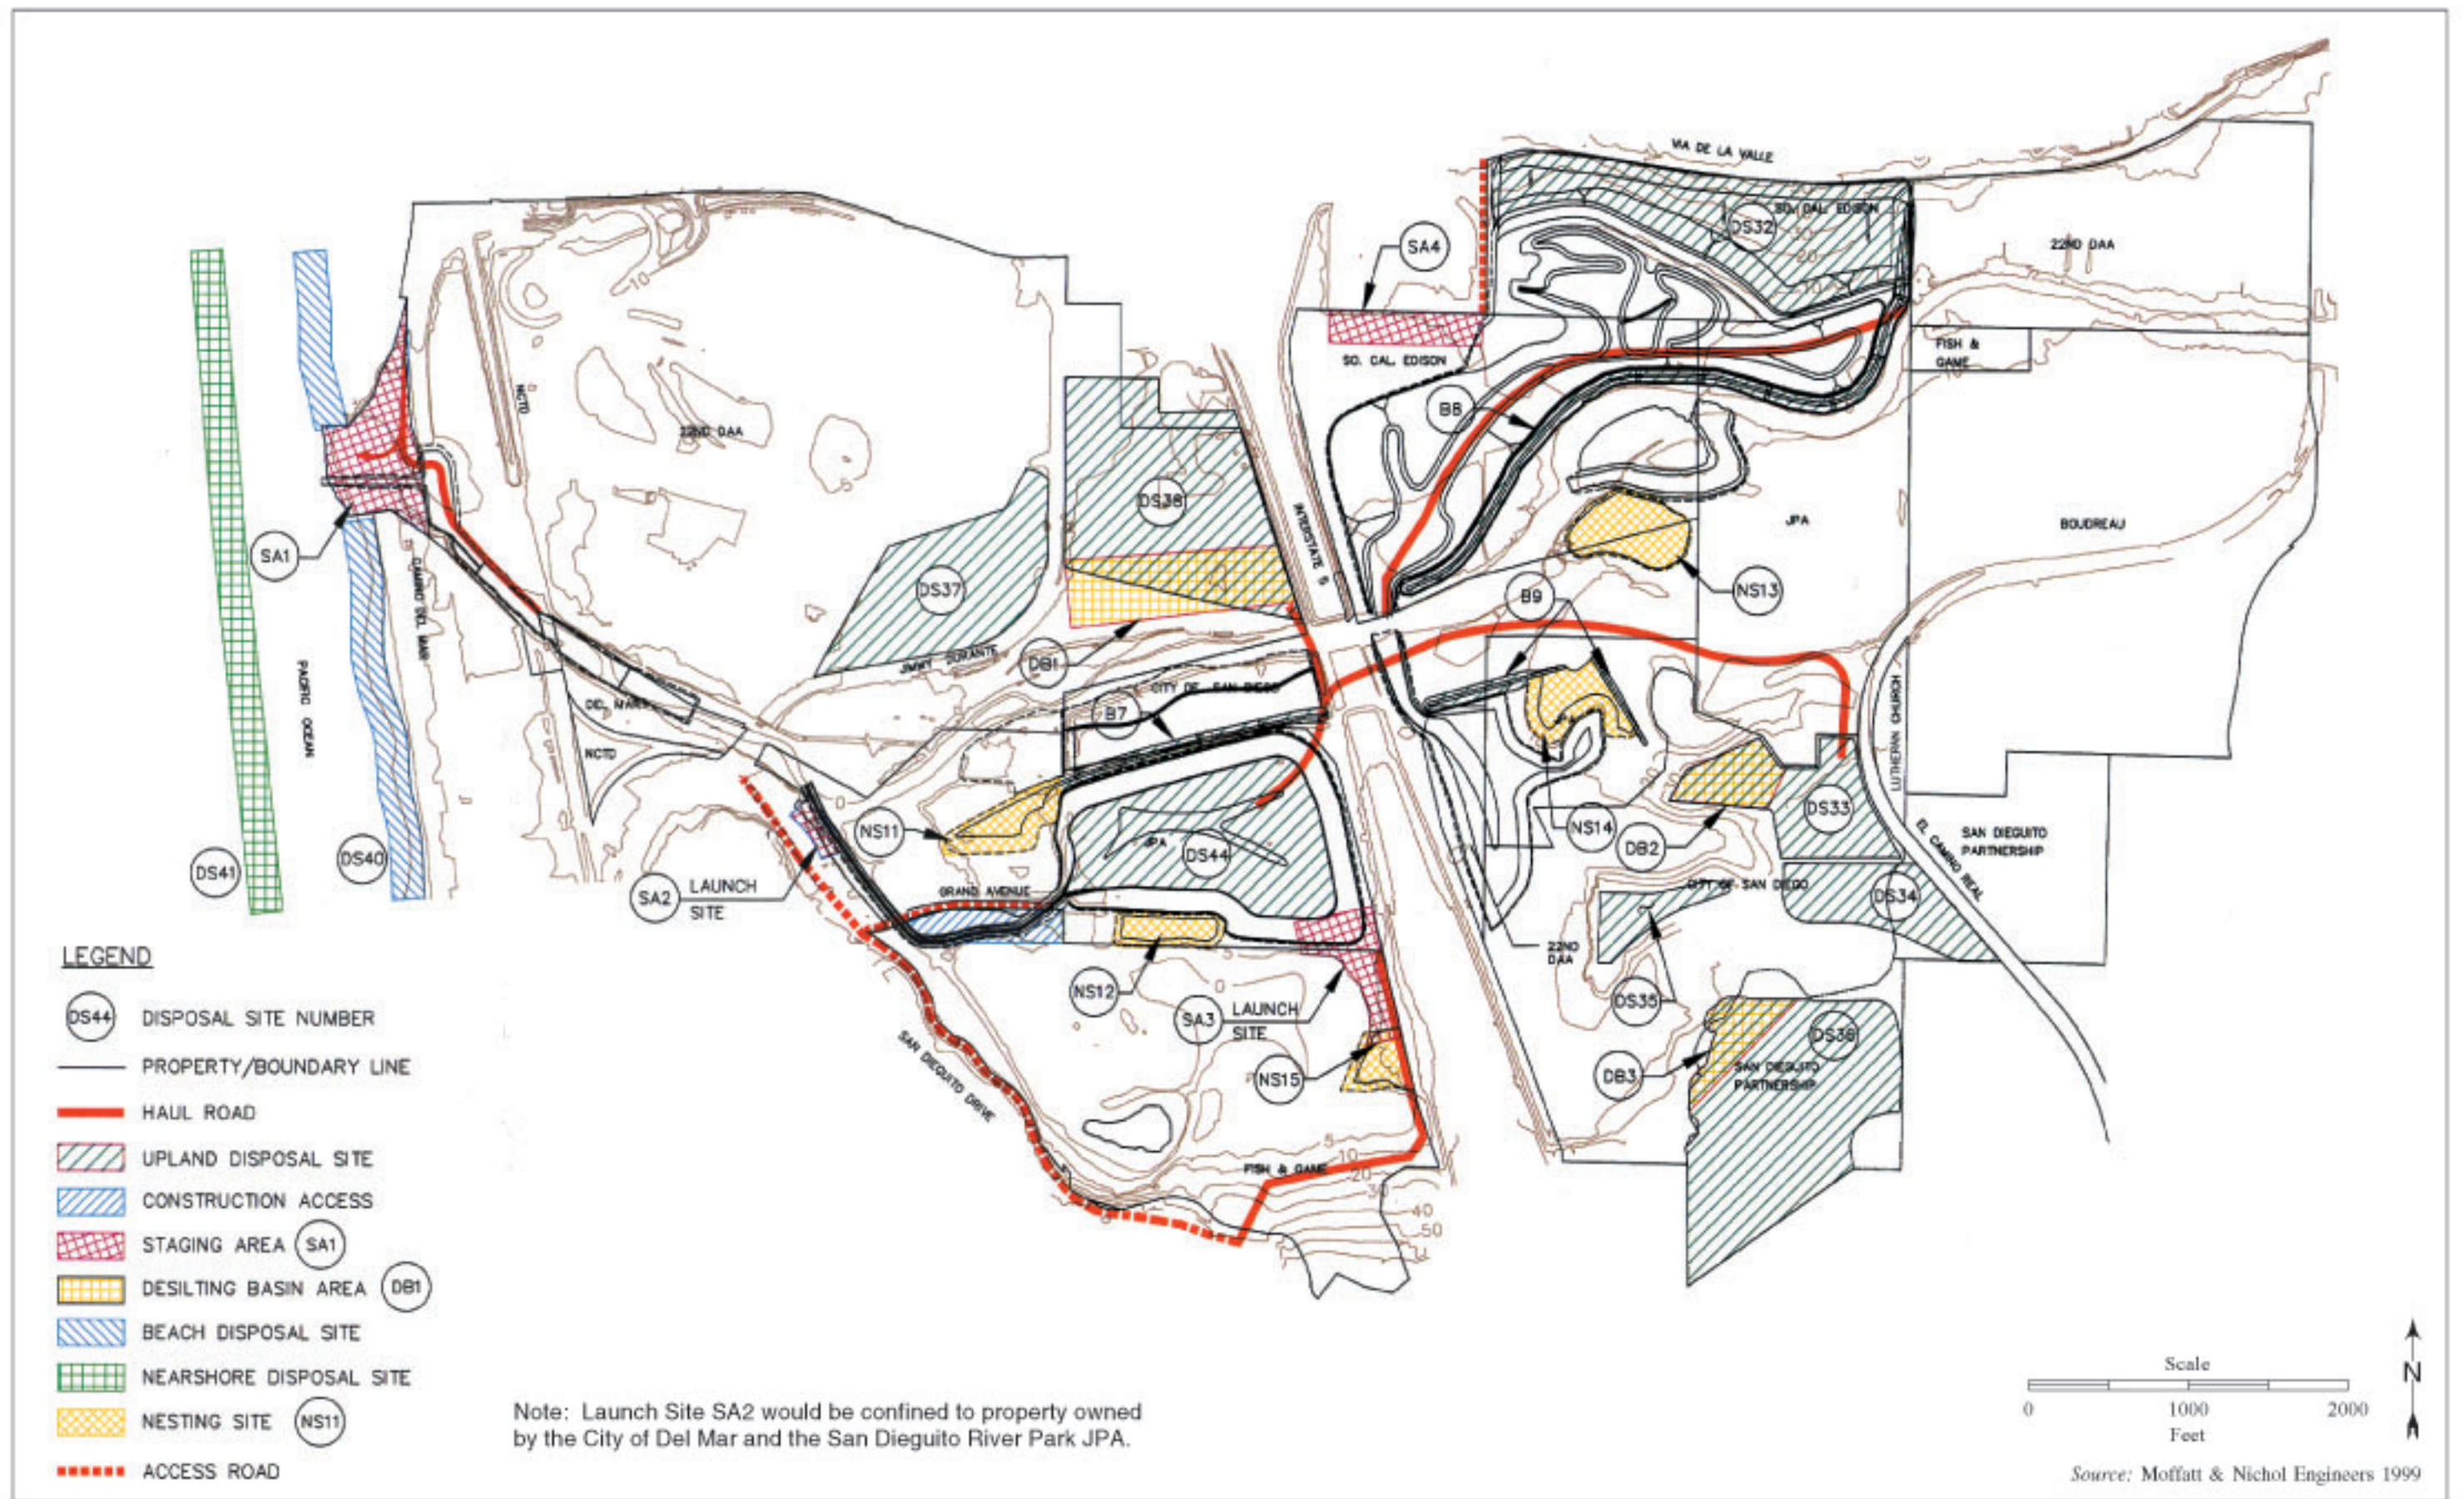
Potential Haul Roads, Construction Access, Staging and Desilting Basin Areas
